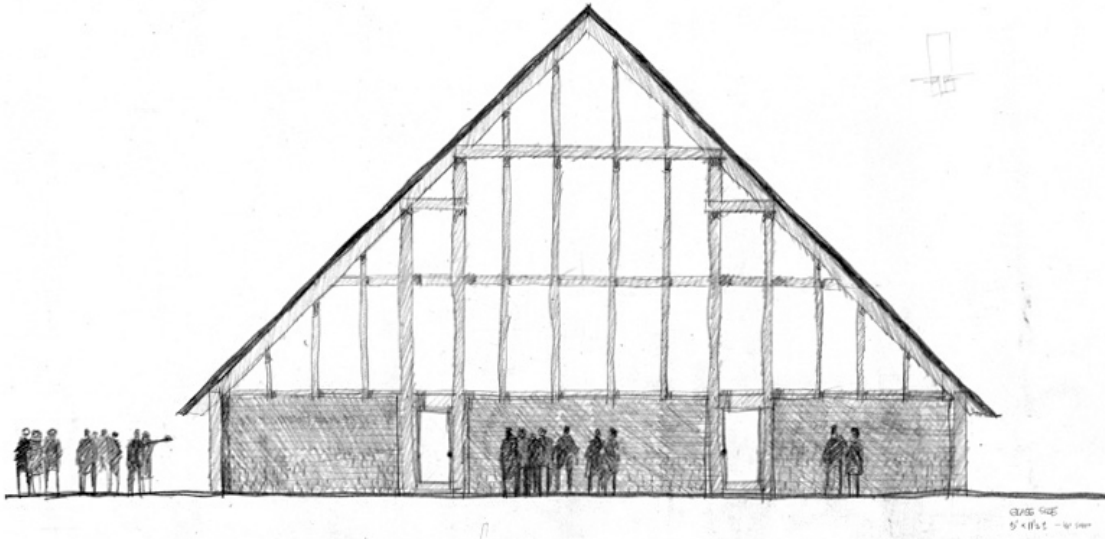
Sketch for east elevation, 1966, Jim Owens and John Dinkeloo.
